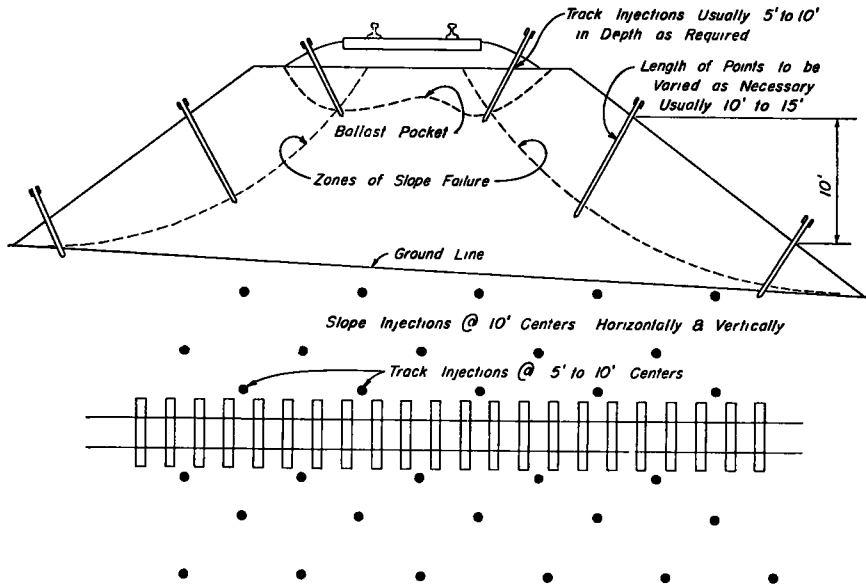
Pressure Grouting—Typical Injection Plan for Fill Slope Failures
